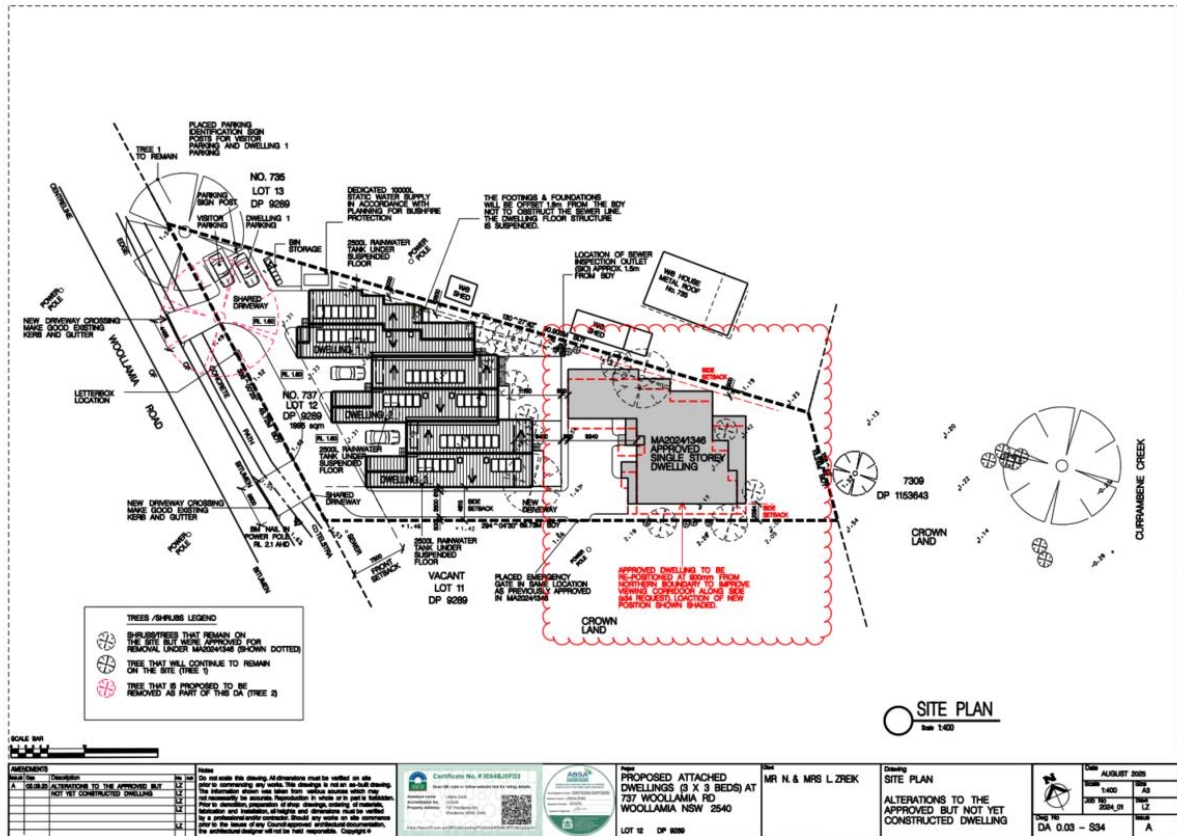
Site Plan– note red clouded dwelling approved under DA23/1694
